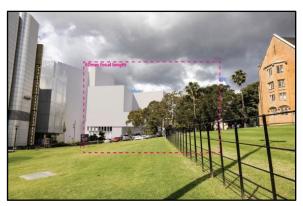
Proposed view - facing south – connecting St Johns to RPA (Source: Architectus, "Visual Impact Assessment," 2022)
